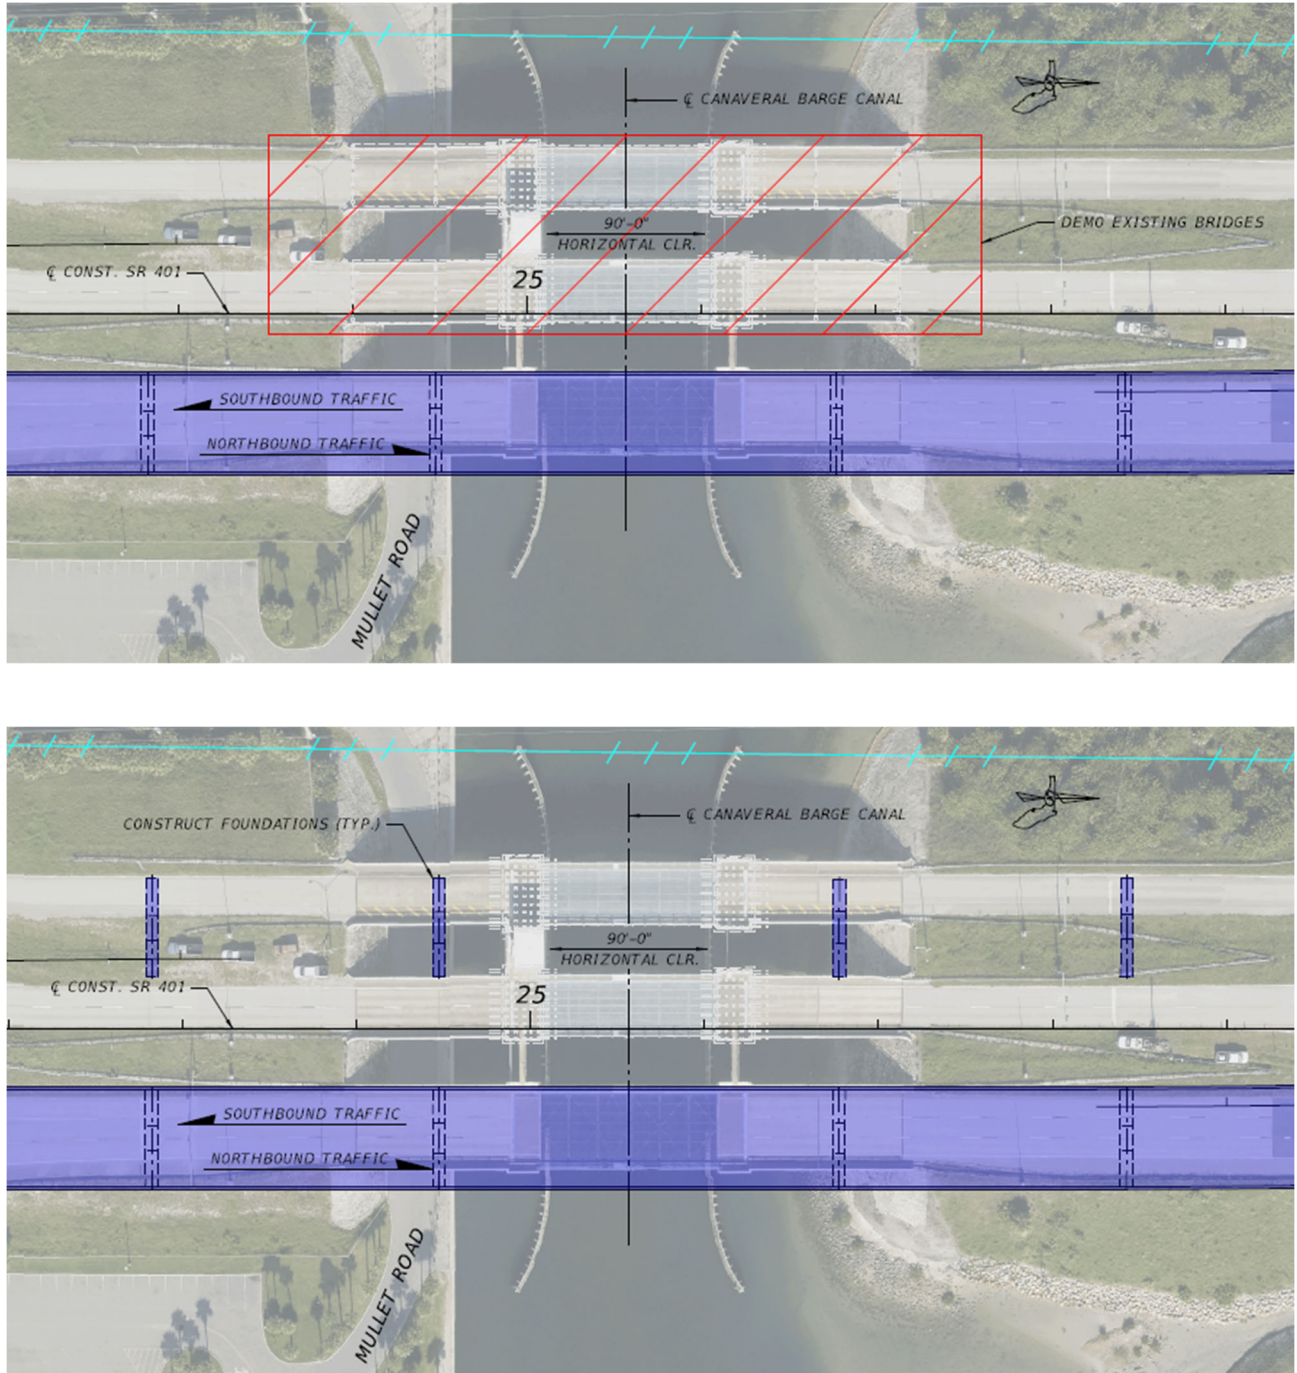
Traffic Control Plans Phase III-Demolish and Construct SB Bridge
